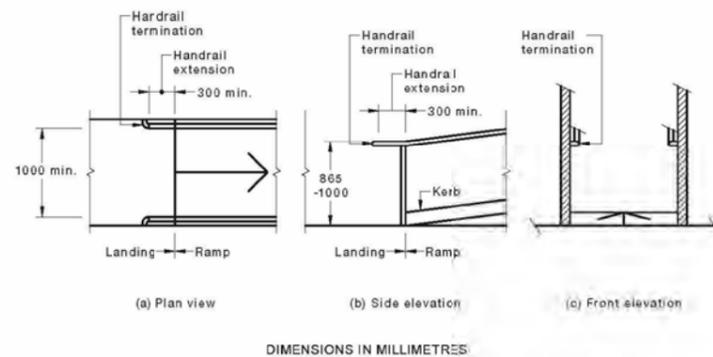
(B) RAMP HANDRAILS—DETAIL FOR HANDRAILS TERMINATED BY TURNING HORIZONTALLY THROUGH 90° TO THE WALL
